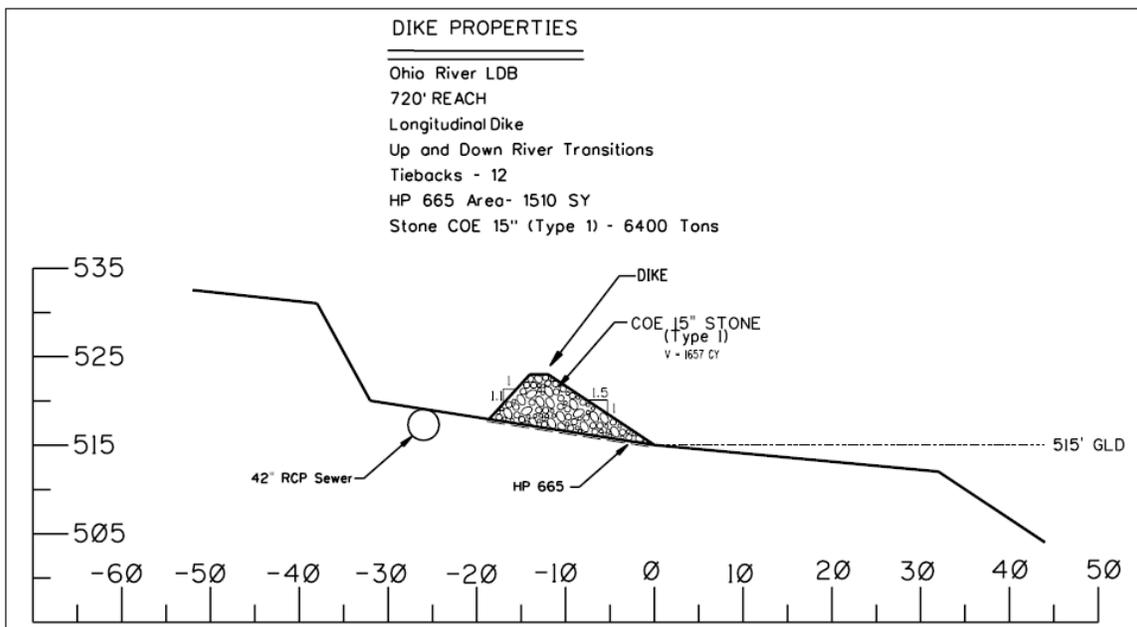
Typical cross section of longitudinal dike protection of sewer line. Area behind dike will fill in naturally. Scale is in feet.
